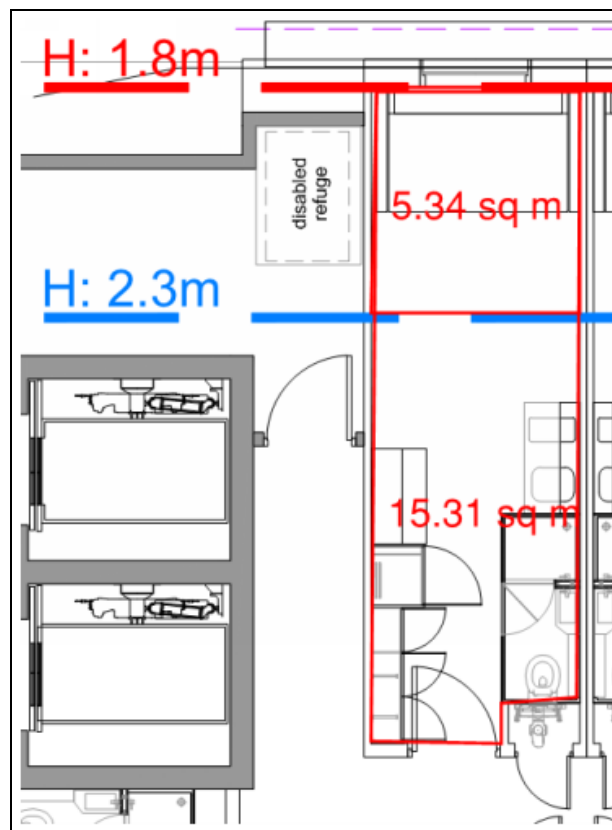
(above): Image of one of the single units, showing the overall floor area and the space within the lower ceiling height
